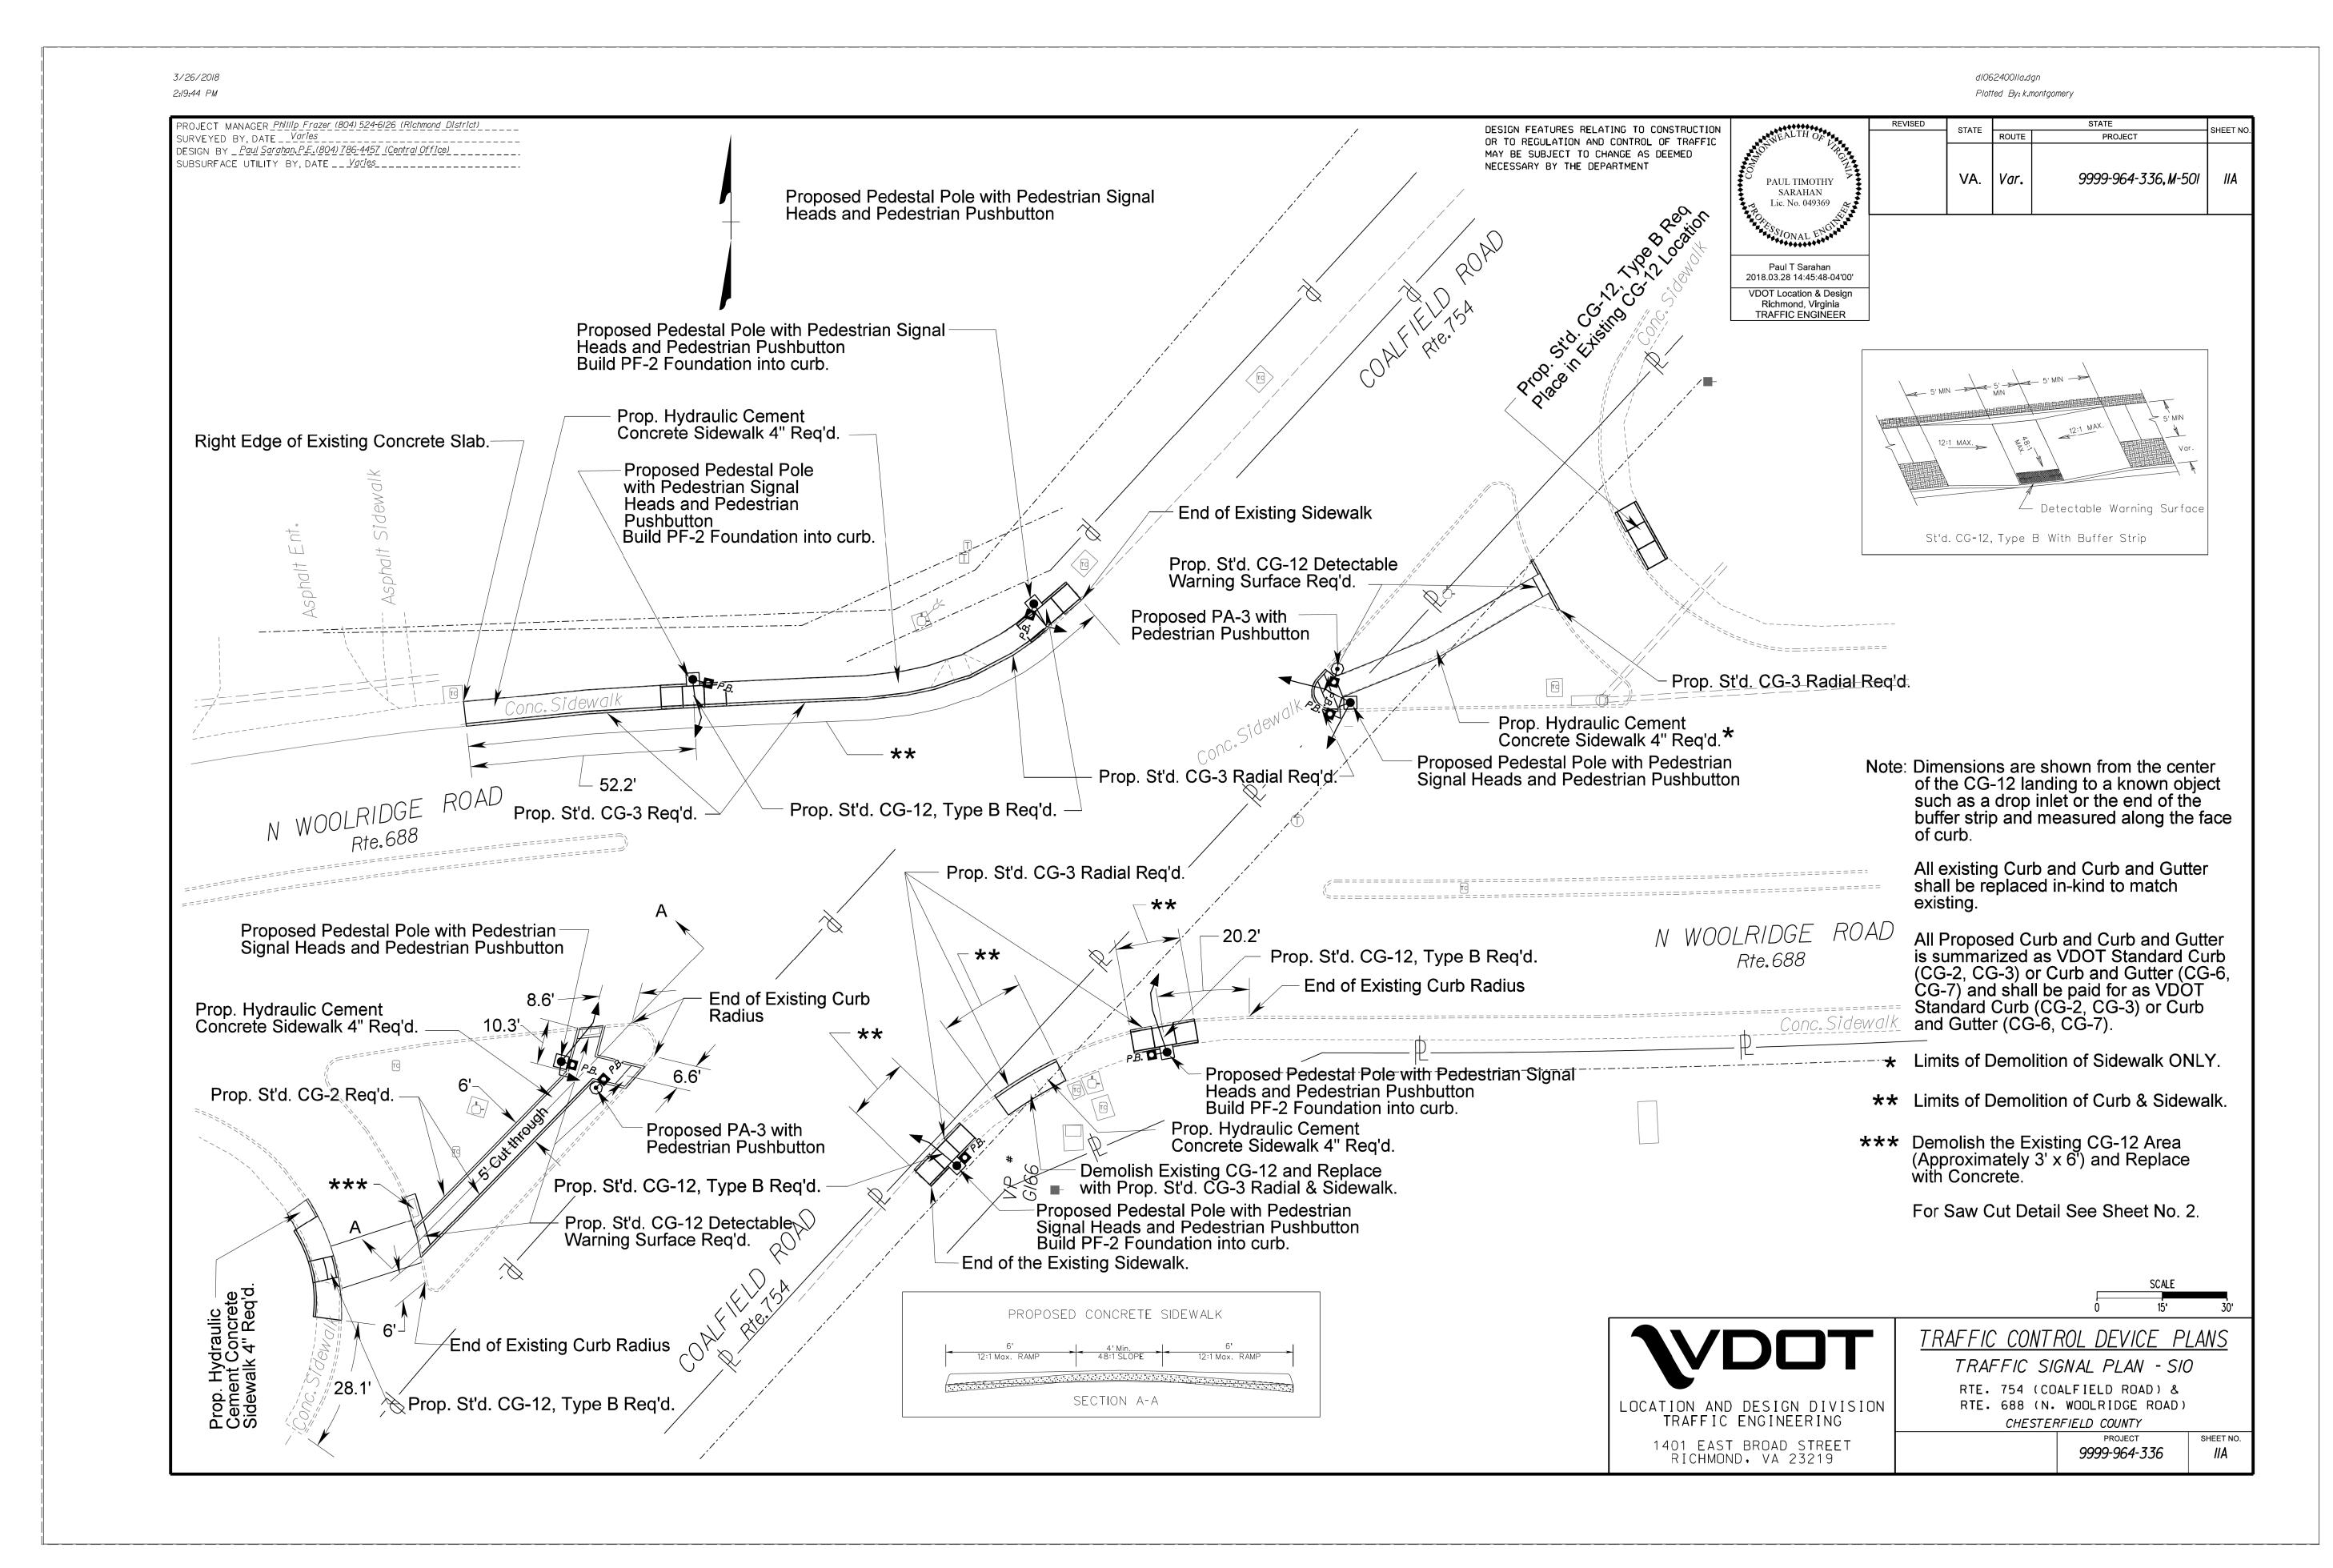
H - 43 SAMPLE PEDESTRIAN CROSSWALK PLAN (FOR ALTERATION PROJECTS ONLY)
